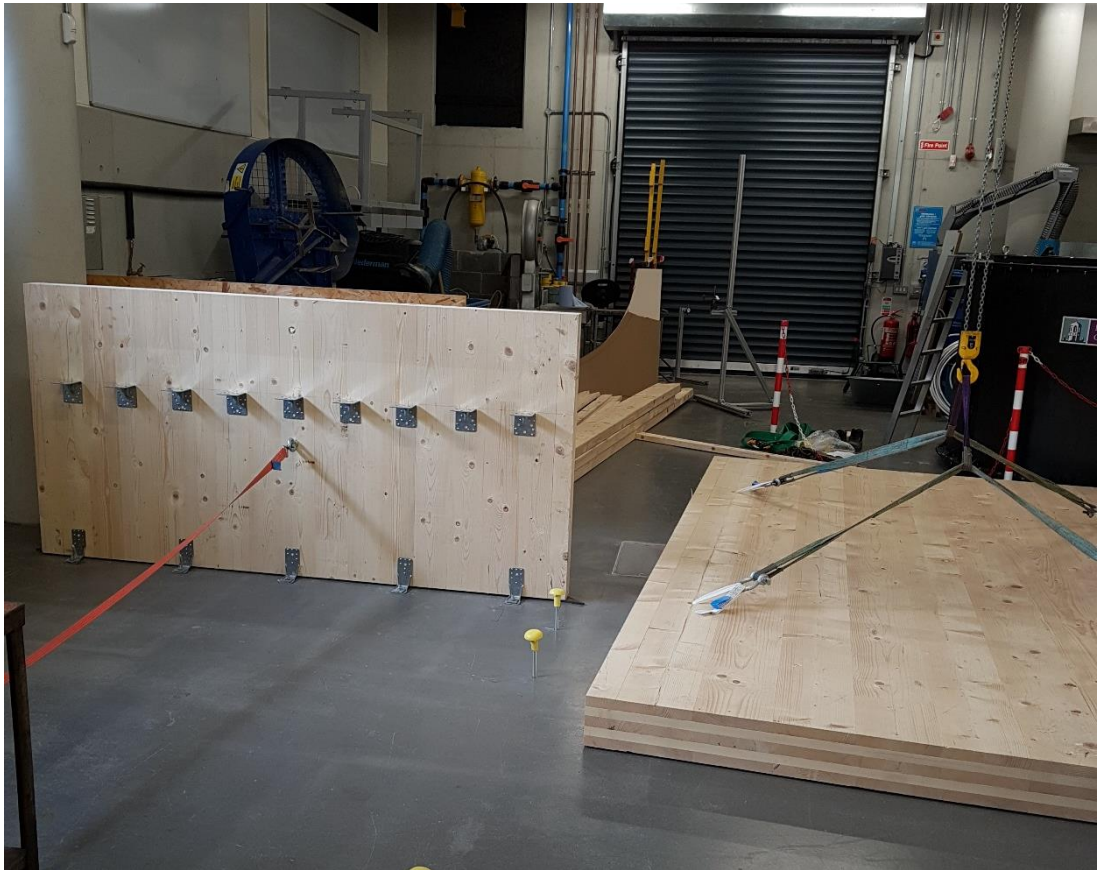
Erection of one-way span balloon construction @ NUI, Galway
